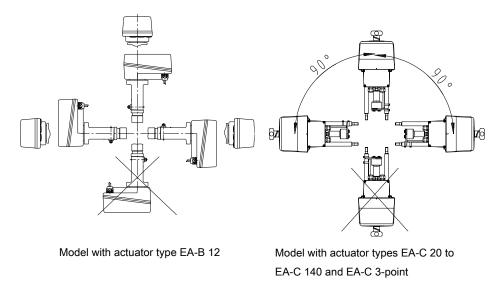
Installation position depending on actuator type Install the actuator with sufficient clearance for removal.
